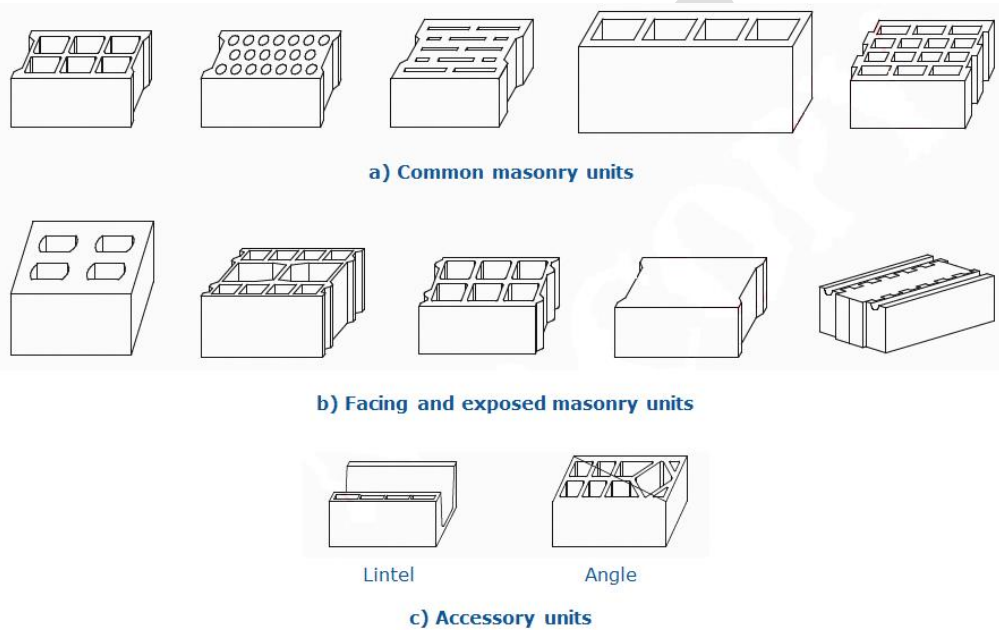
Examples of different concrete masonry unit forms (Source: EN 771-3)
